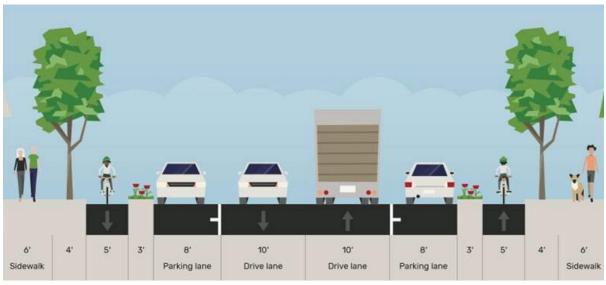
Typical street standard option for new essential streets. Some of the first new developments could make use of public funding to meet street requirements.
